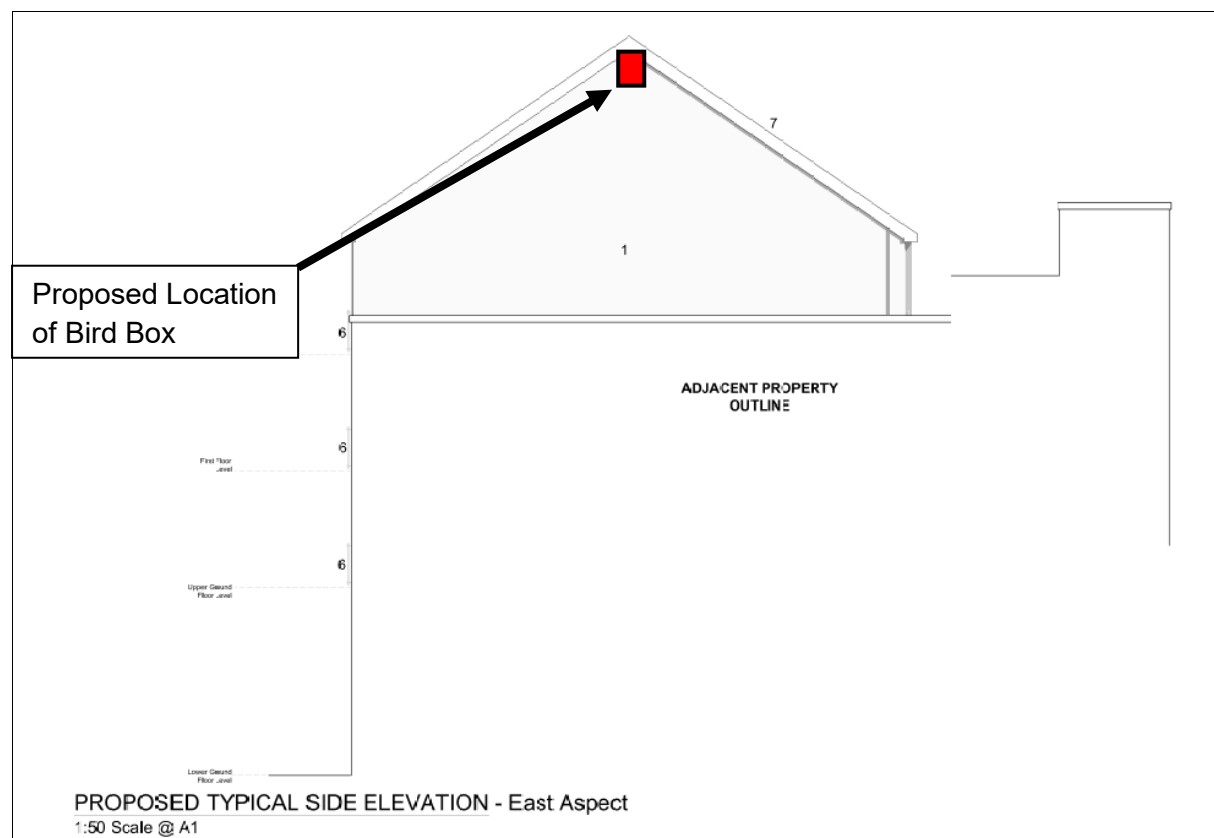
Location of Proposed Bird Box to Enhance Biodiversity at the Site
